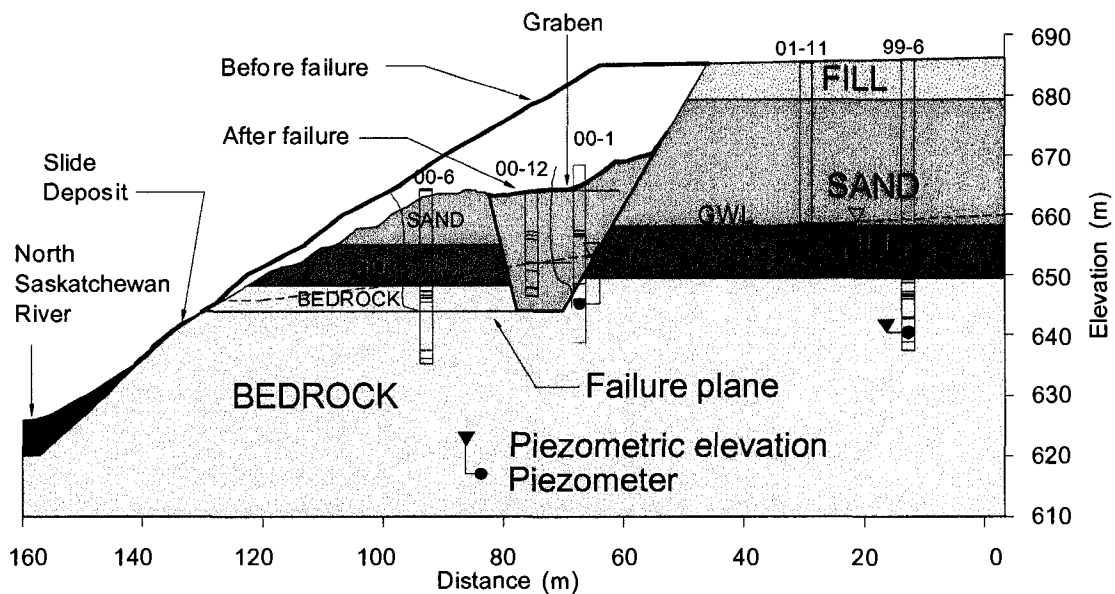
Pre-failure and post-failure cross-section (Whitemud Road Landslide)
